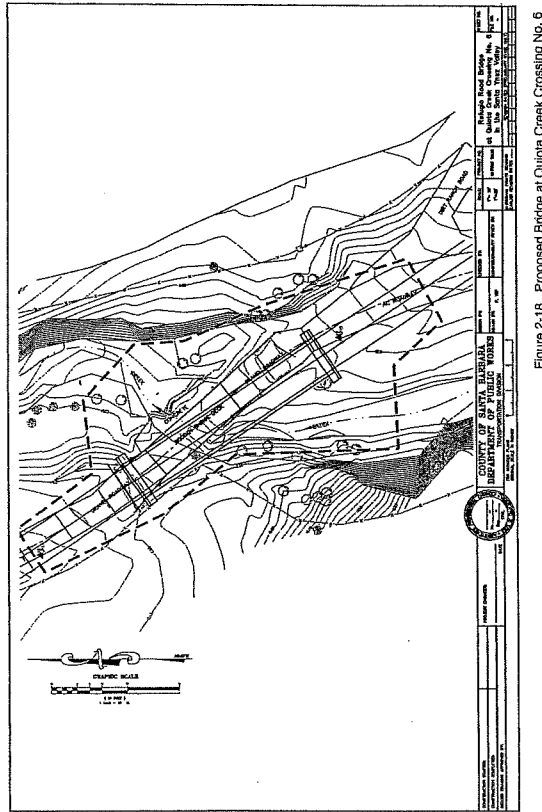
Proposed Bridge at Quota Creek Crossing No. 6
